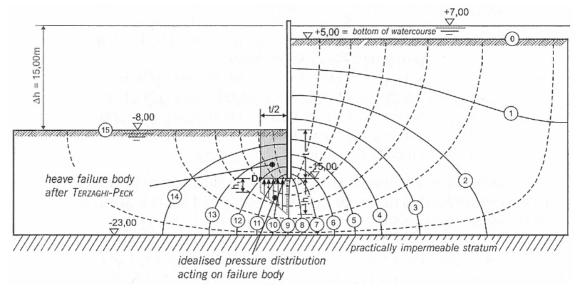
Hydraulic heave by Terzaghi-Peck method
